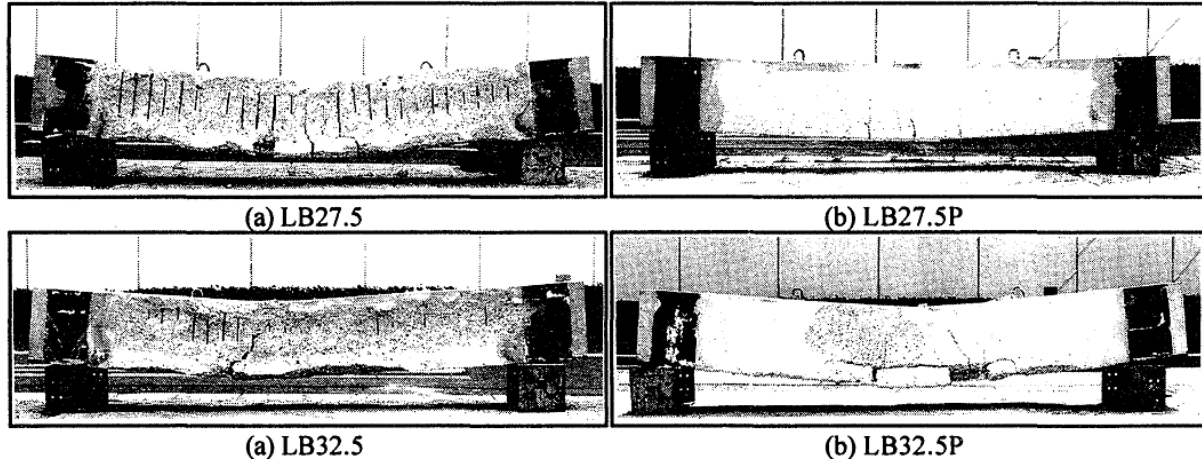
Beam after fire test under vertical compressive loading indicating different spalling effects on concrete with and without polypropylene fibre (Note: LB27.5: load (L), beam (B) and 27.5 is the % of water to cement ratio, similar meaning for others) [45].
